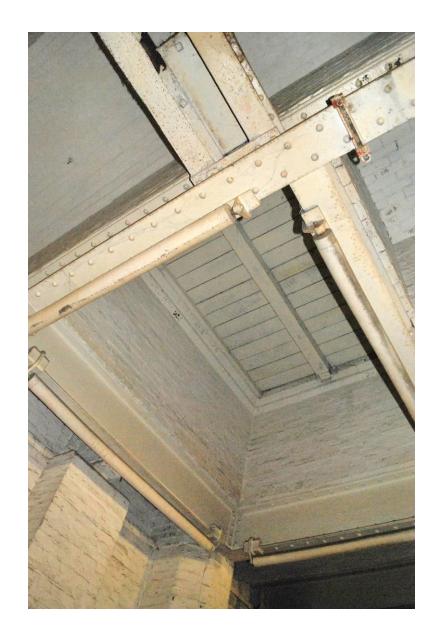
(above): Detail of rollers below trap door to protect against wear from ropes.
